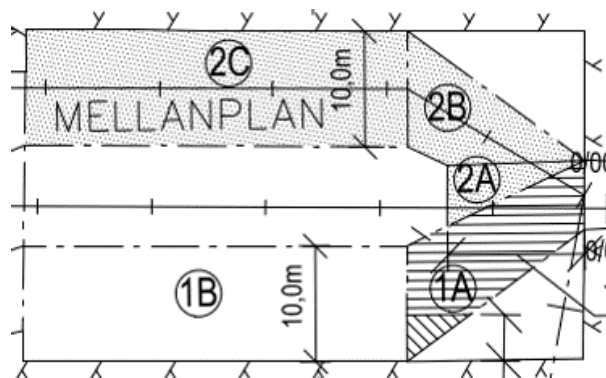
pilot tunnels divided into various sections based on rock support design. From: Trafikverket (2022b).
